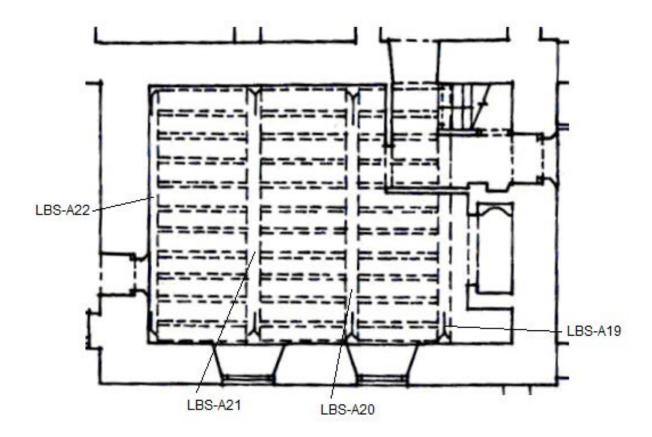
Central hall/parlour range; showing the location of samples LBS-A19-22 (Martin Roberts)
